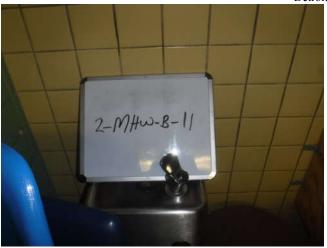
Bubbler, located in a 2nd floor Next to staff room across from room 203 (Middle School)
